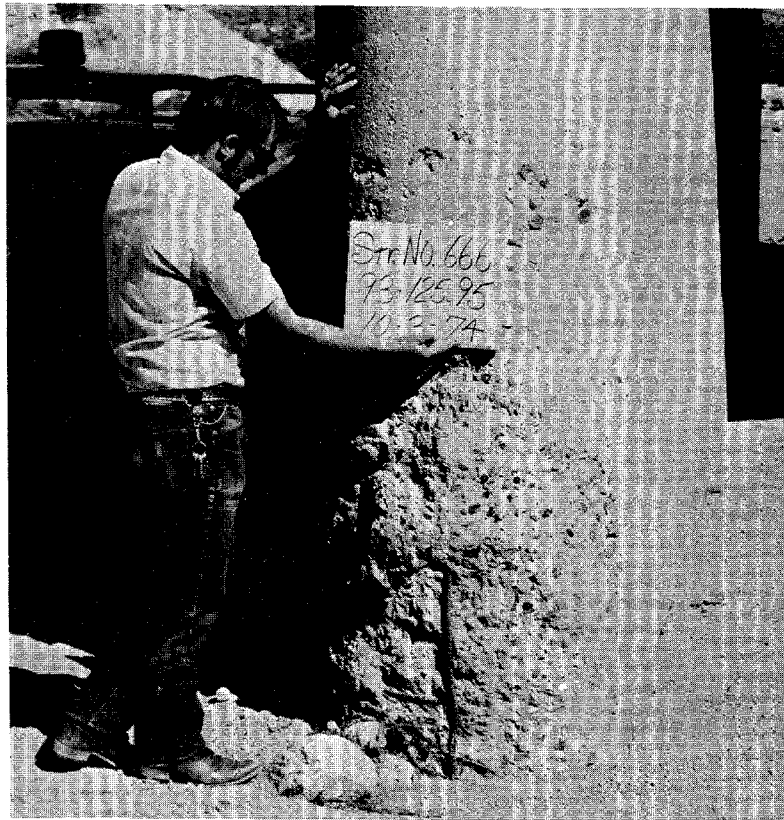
Abrasion damage on upstream side of pier, in 1974. (From Arizona Dept. of Highways.)
